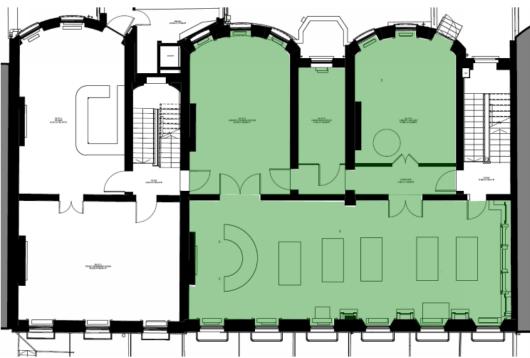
(above): Ground floor plan showing location of Lecture Hall. Figure 2 (below): First floor plan showing location of Library.
